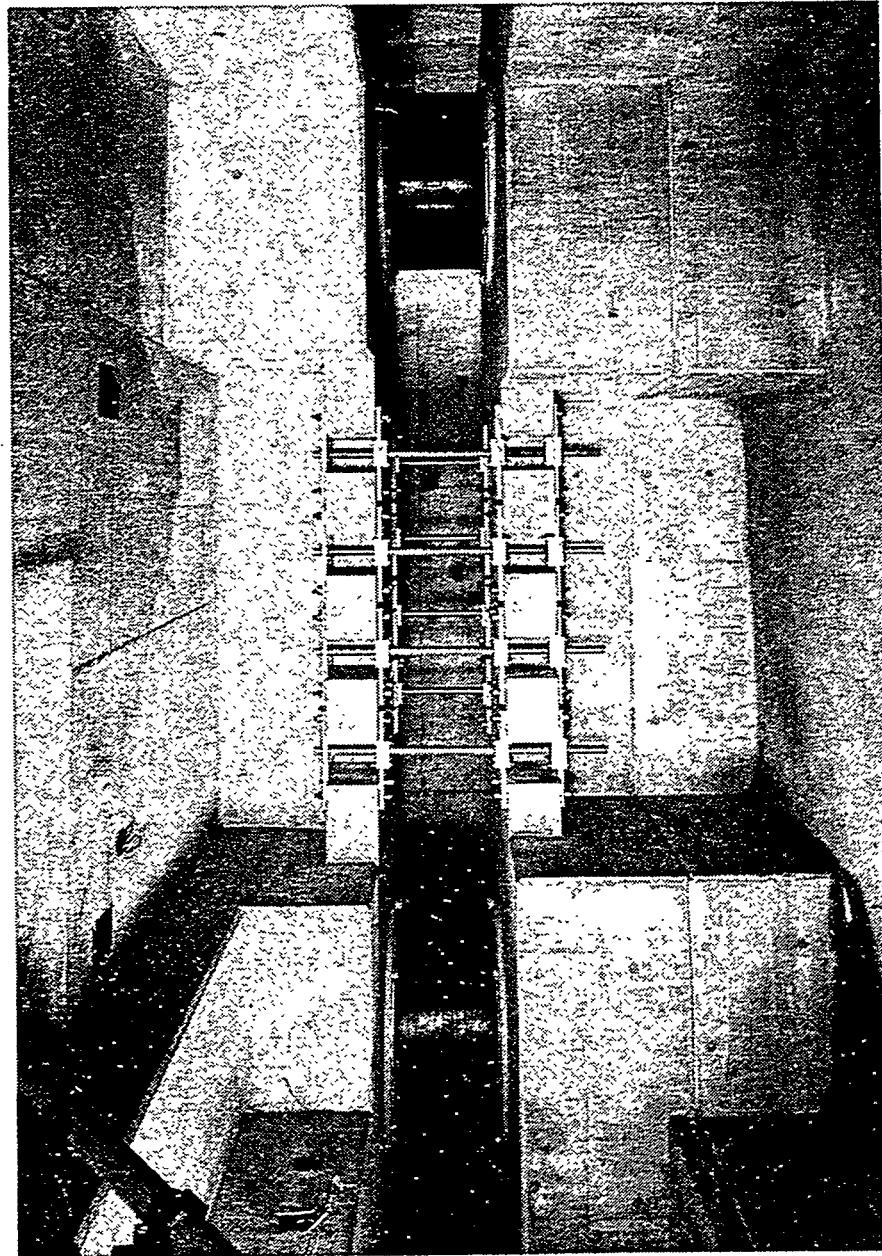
Isolators and Cantilever Type Elasto-Plastic Steel Dampers
